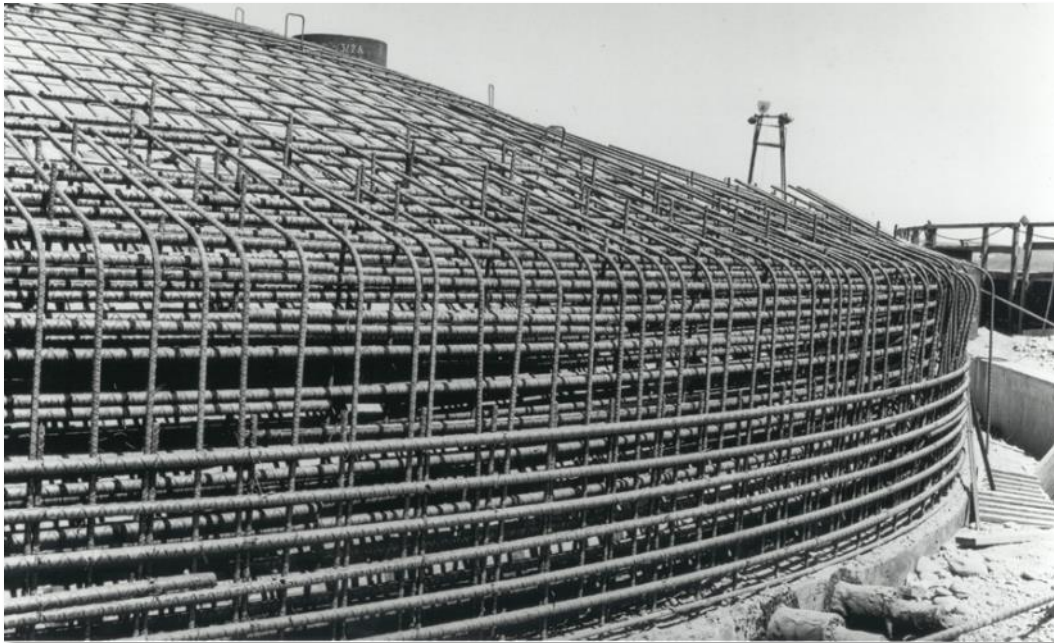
View of Reinforcement Steel in the Haunch Region (RPP-PLAN-61510)
